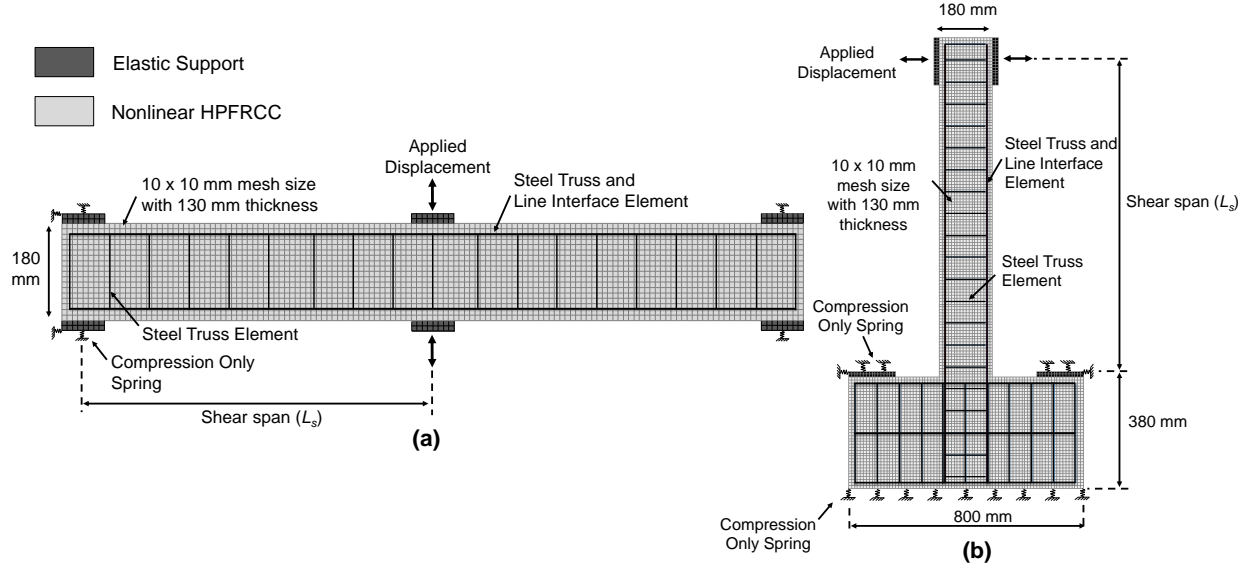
Finite Element Models (a) simply supported beam (b) cantilever beam
